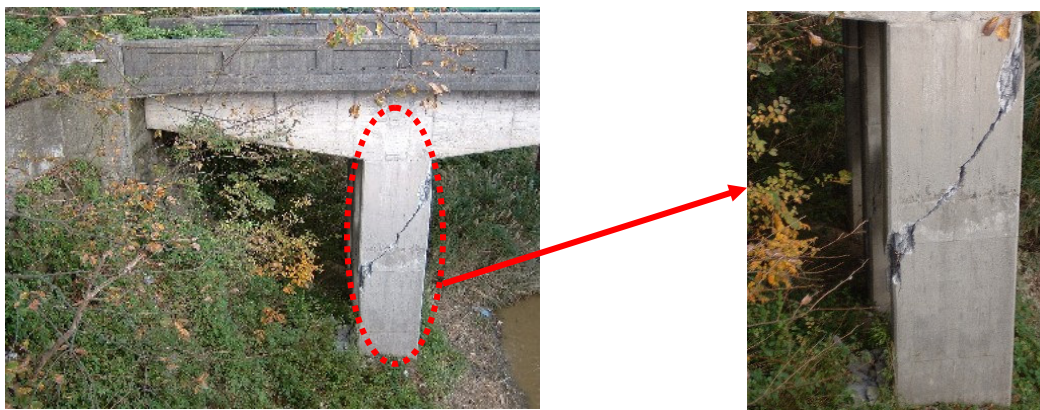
Shear cracks in one of the pier columns, old Uragara Bridge
